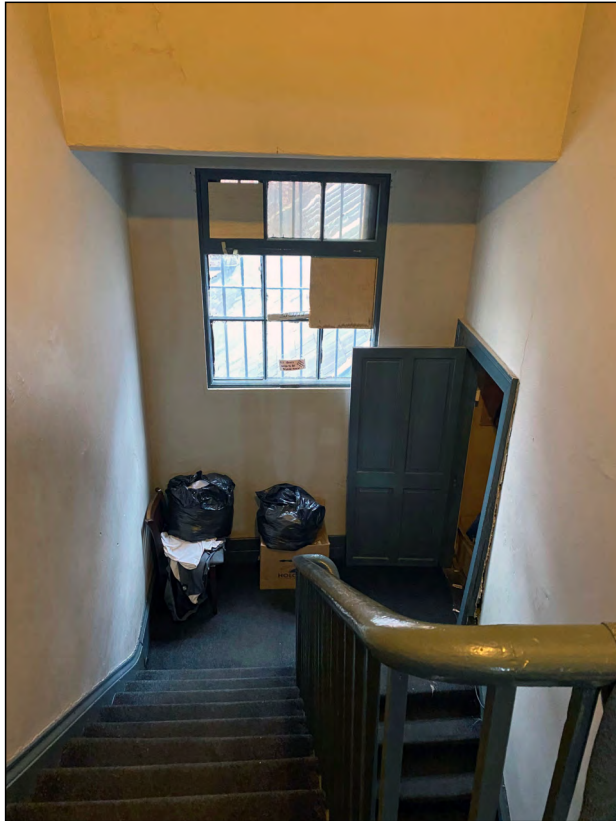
View from loft landing to mid-stair landing with storage cupboard to right of view.
